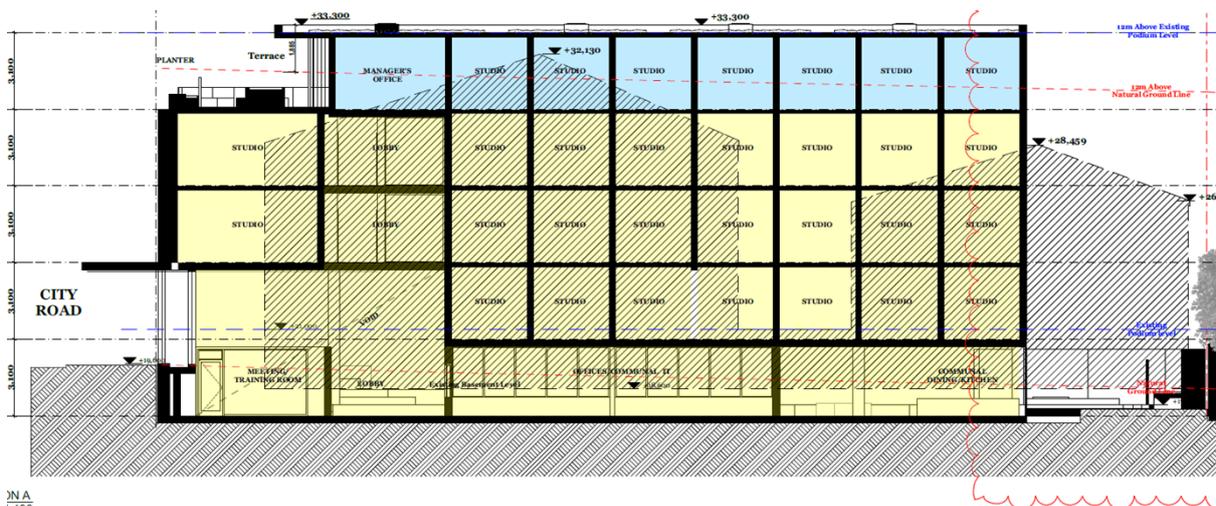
East-west section through the boarding house building, with an outline of the existing buildings behind
